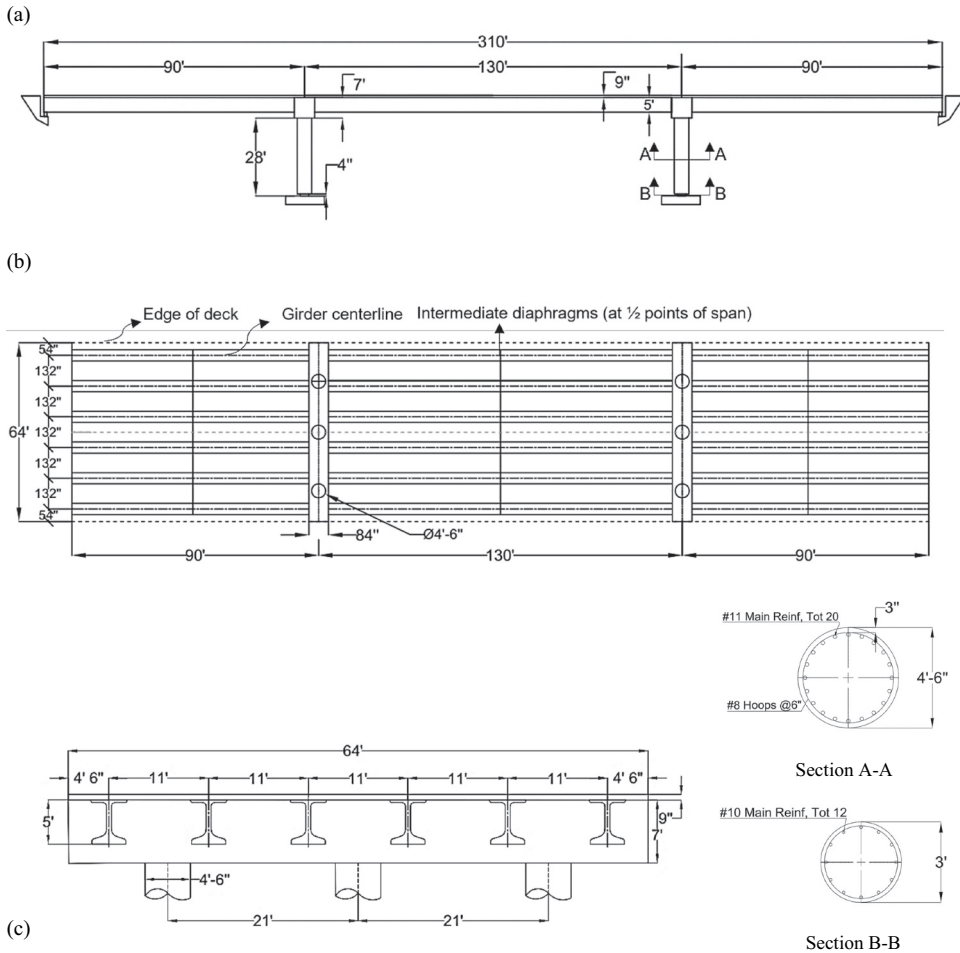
(a) Elevation view of the bridge model (b) Plan view of the bridge model (c) Cross sections of the girder, column and hinge.
